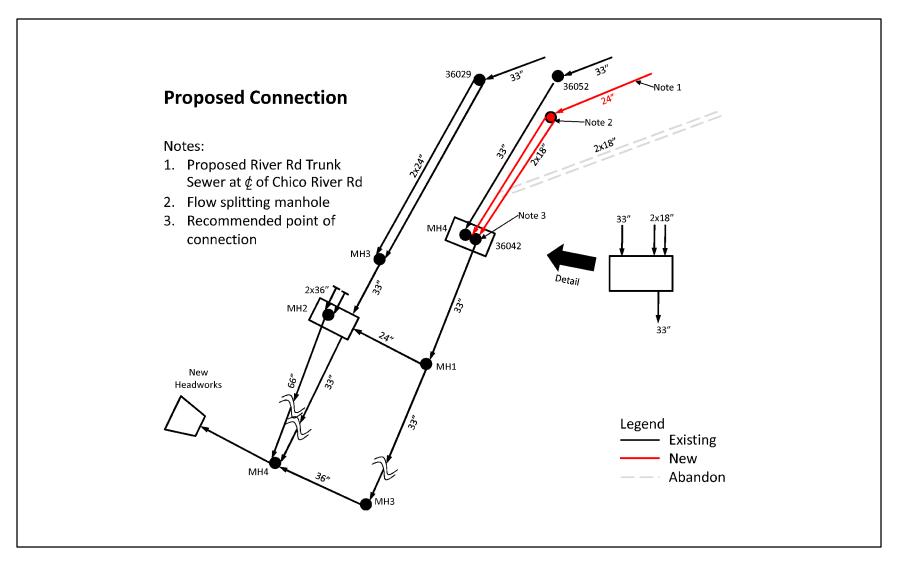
PROPOSED RIVER ROAD TRUNK SEWER CONNECTION RIVER ROAD TRUNK SEWER HYDRAULIC ANALYSIS CITY OF CHICO
